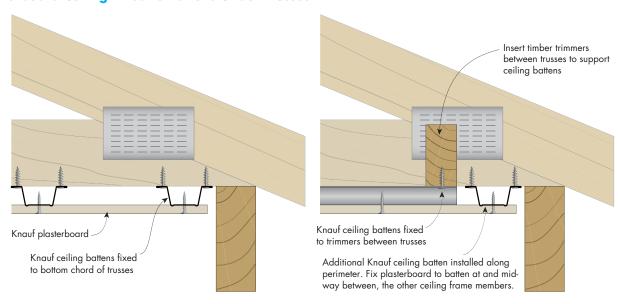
Plasterboard Ceiling Fixed to Battens Ceiling battens installed perpendicular to trusses
